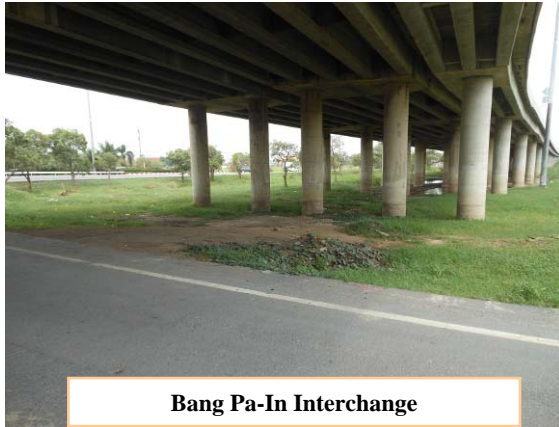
Disposal Area of Construction Debris
